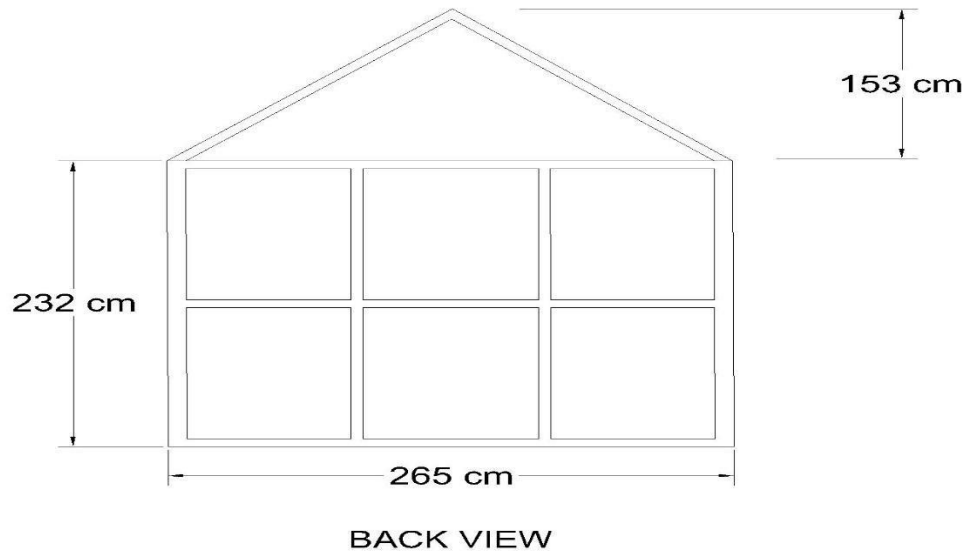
Isometric drawings of the PV-Greenhouse Solar Dryer (Back view)
